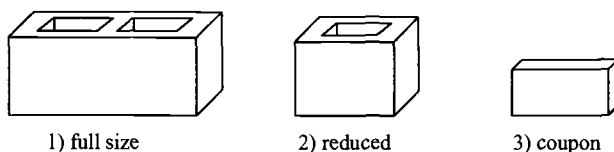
Typical Concrete Masonry Compression Test Specimens
